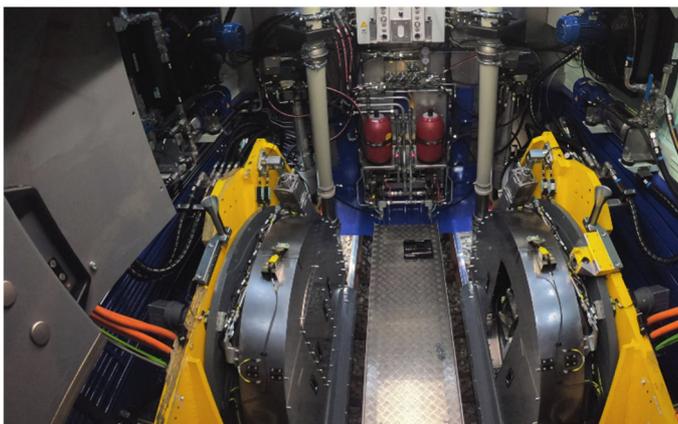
The milling unit room allows protected access to the milling wheels and extraction pipes inside the machine.
